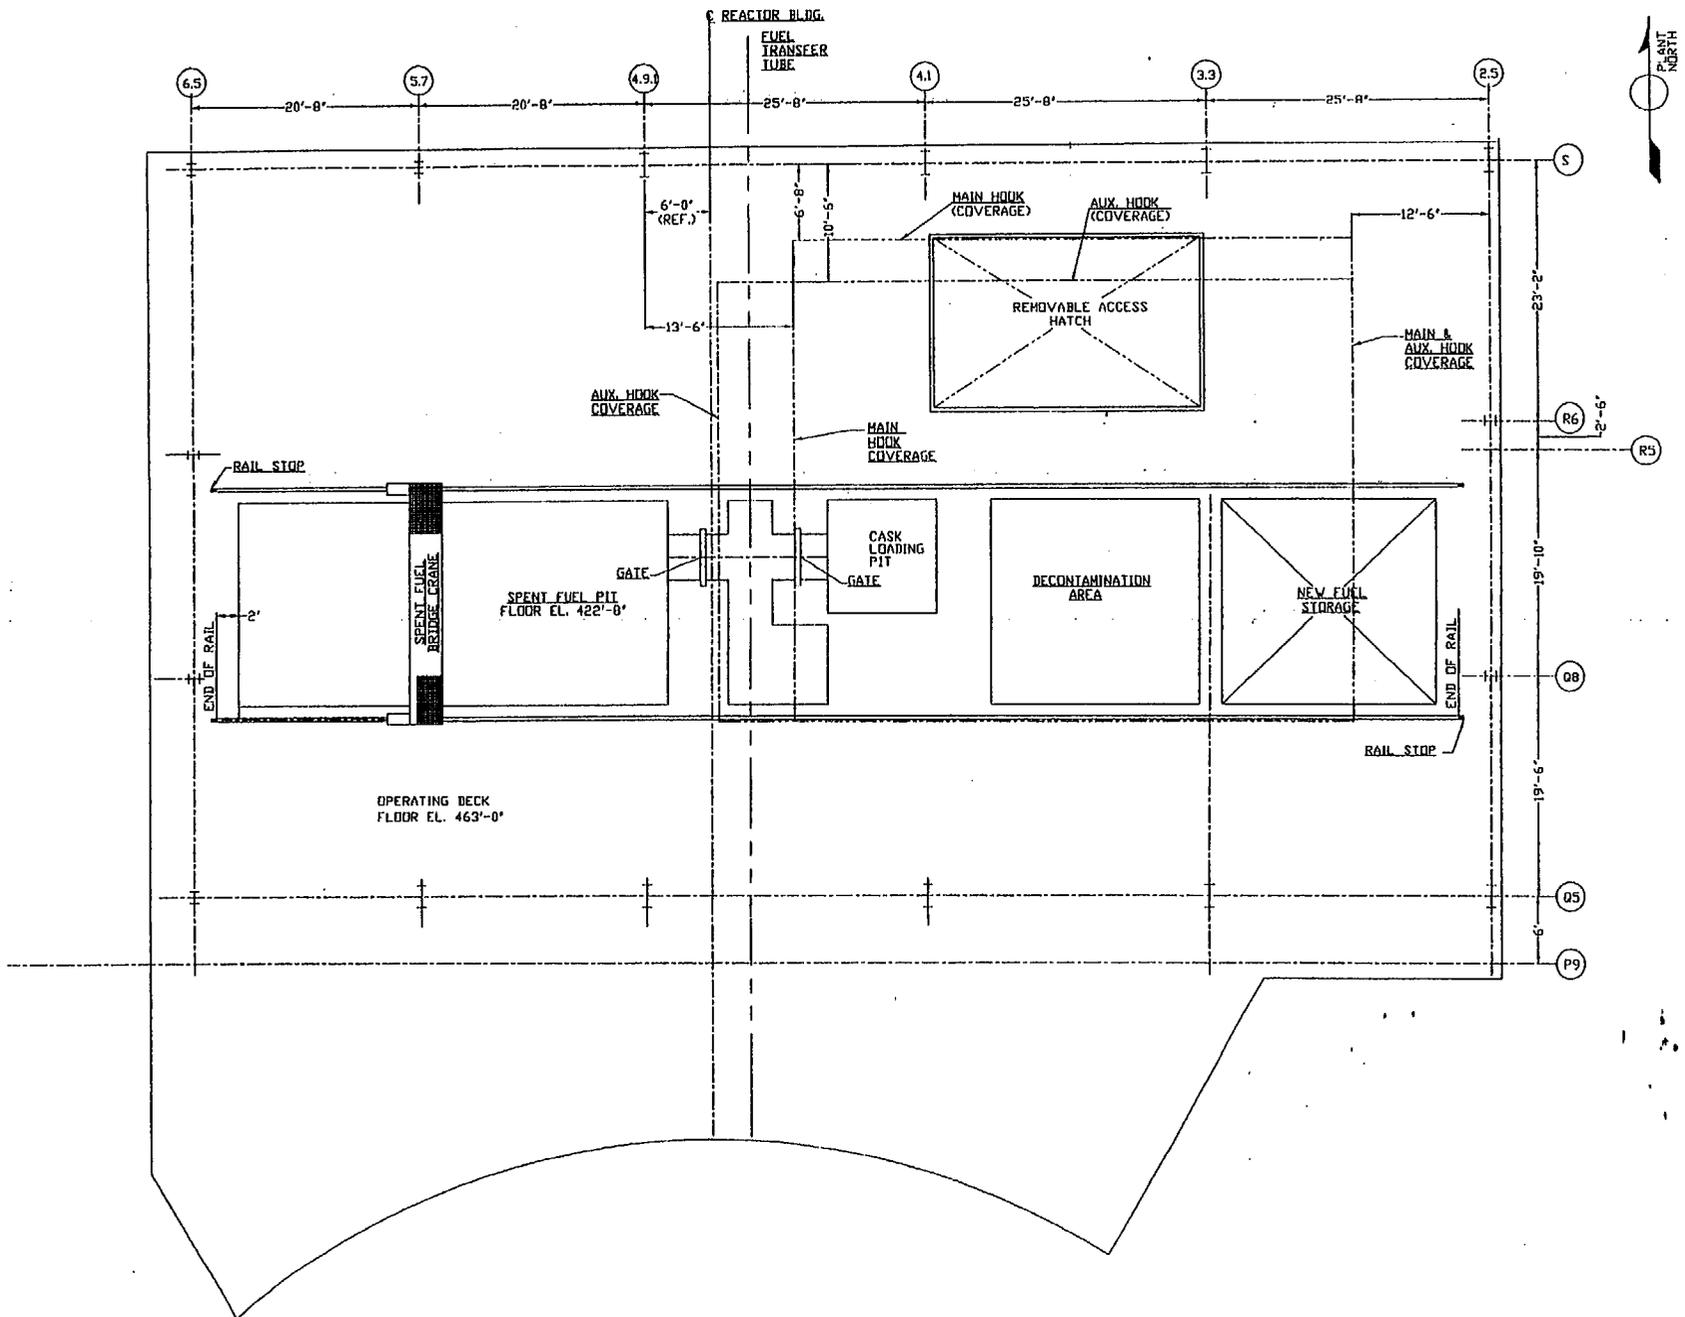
SPENT FUEL POOL OPERATING DECK LAYOUT PLAN
